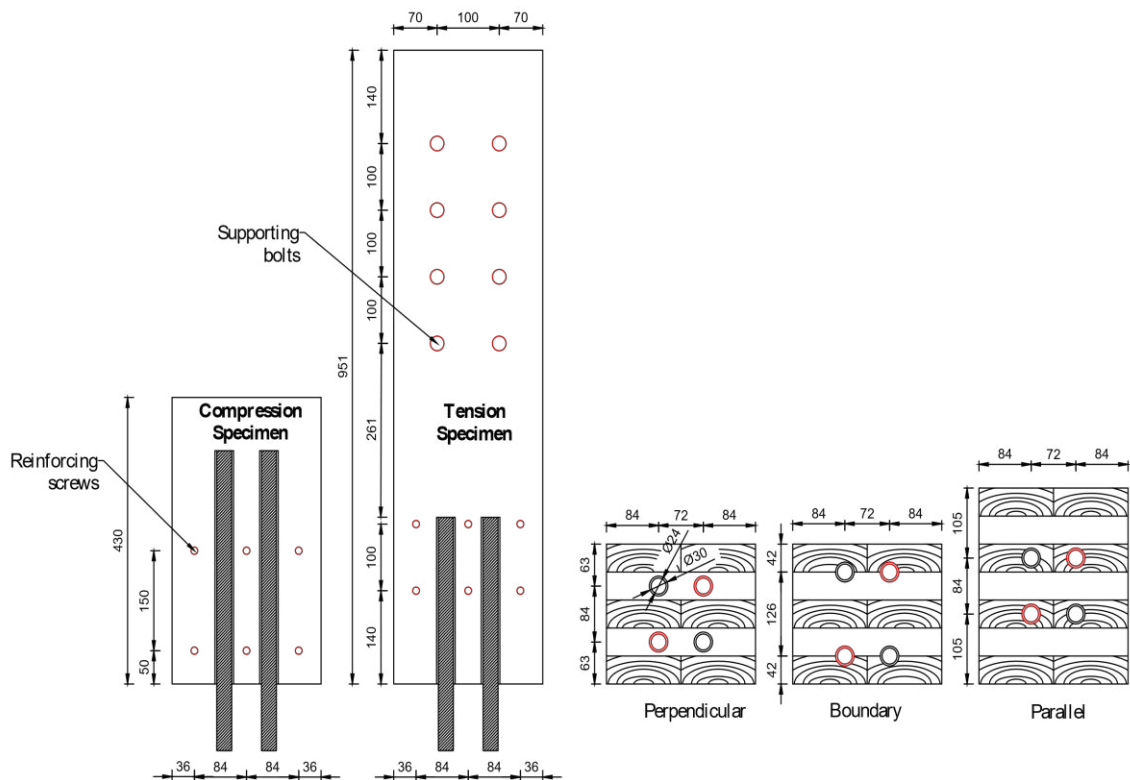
Top view and cross-sectional view of specimens; red holes and rods on the cross sections represent the two diagonally tested rods.
